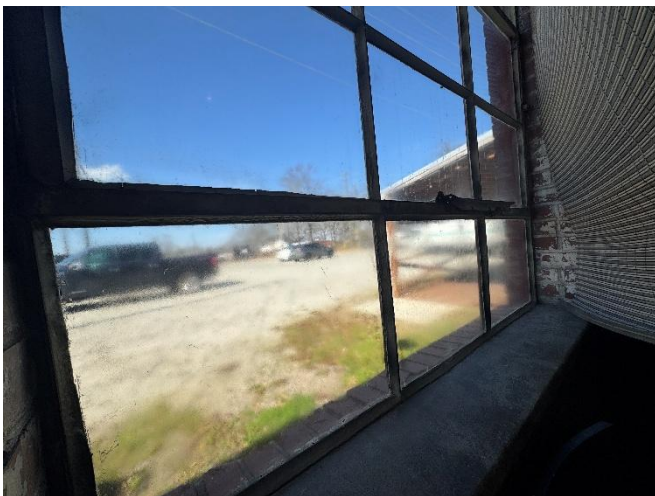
EXHIBIT A: BUILDING PHOTOGRAPHS – INTERIOR
